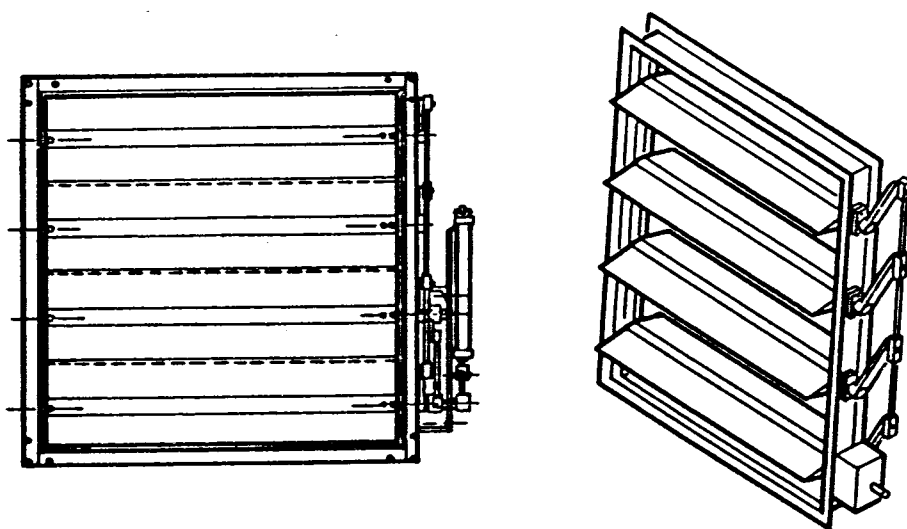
TYPICAL OUTLET FAN DAMPERS
